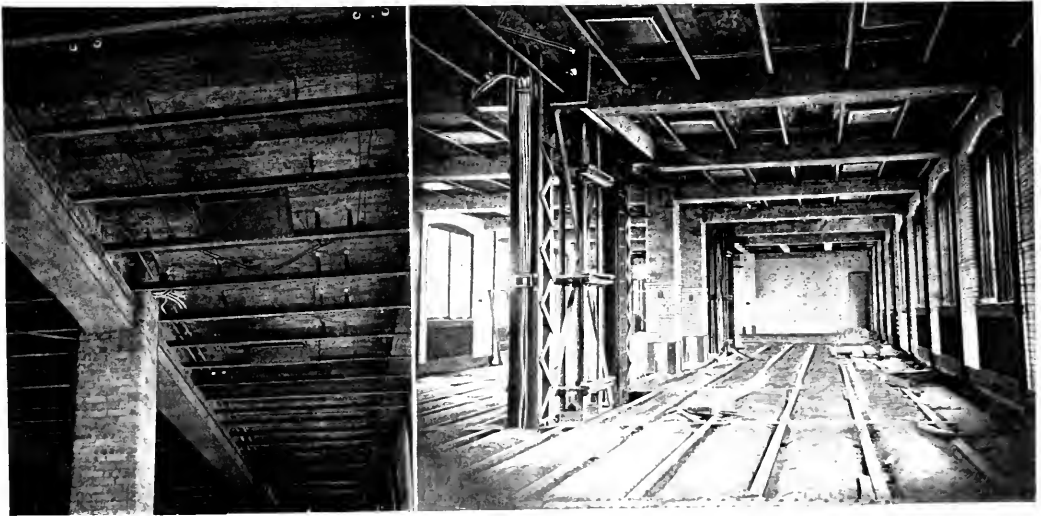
DISTRIBUTION CRIB ON CEILING, AND CONDUITS AND CABLES IN VENT SHAFTS.
